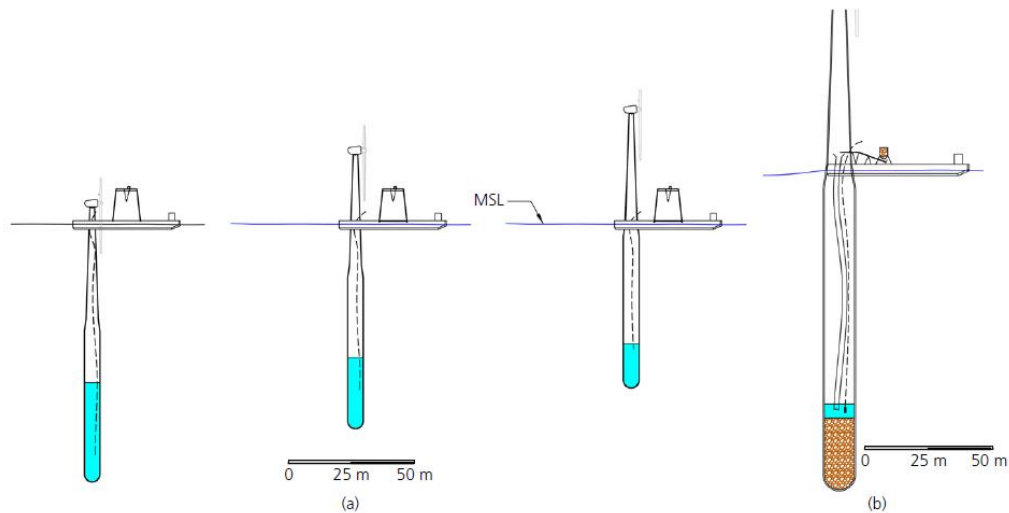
Emerging and ballasting WindCrete (See Ref.[OP5])
